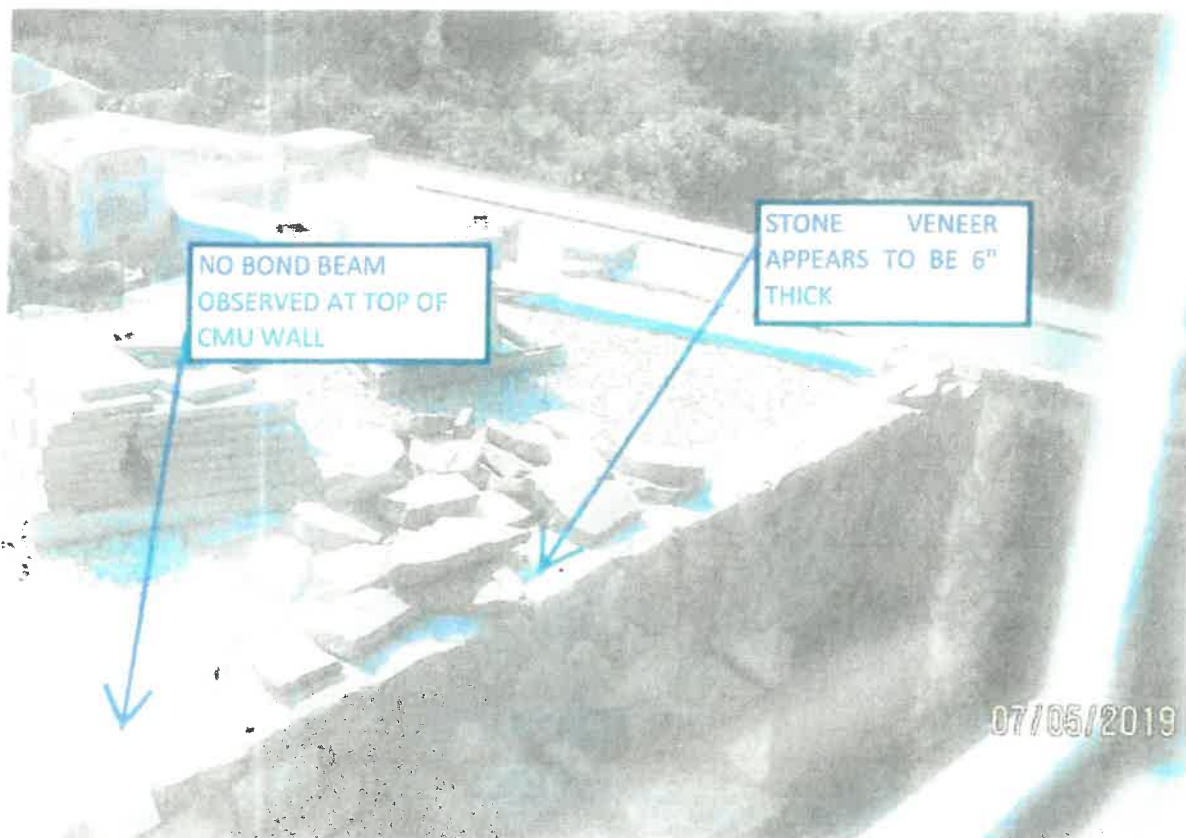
(by others) – Concrete masonry block does not appear to have a bond beam at the top and therefore likely has no horizontal reinforcement.
